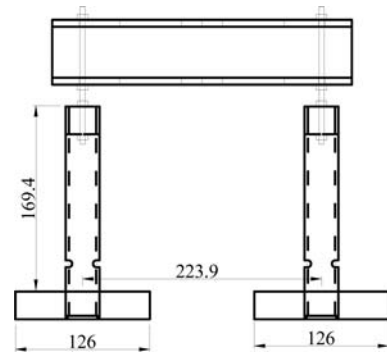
Elevation view of model SD in LJD02 (unit: mm).
